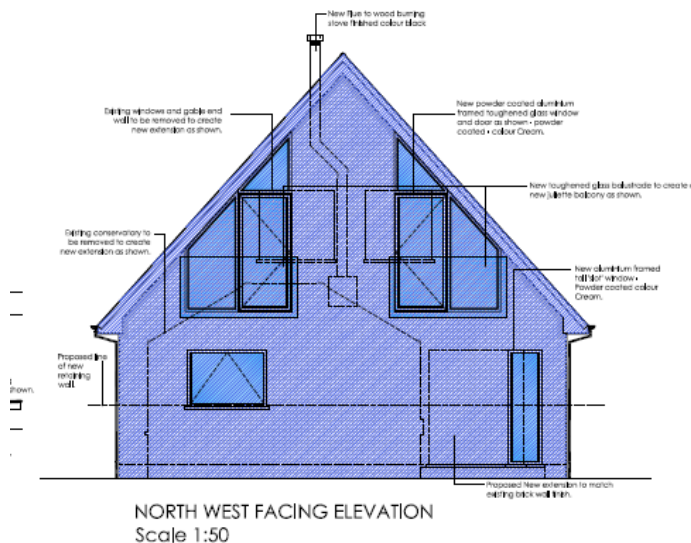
showing approved details relating to the rear elevation to the development under application reference 10/18/0260.
